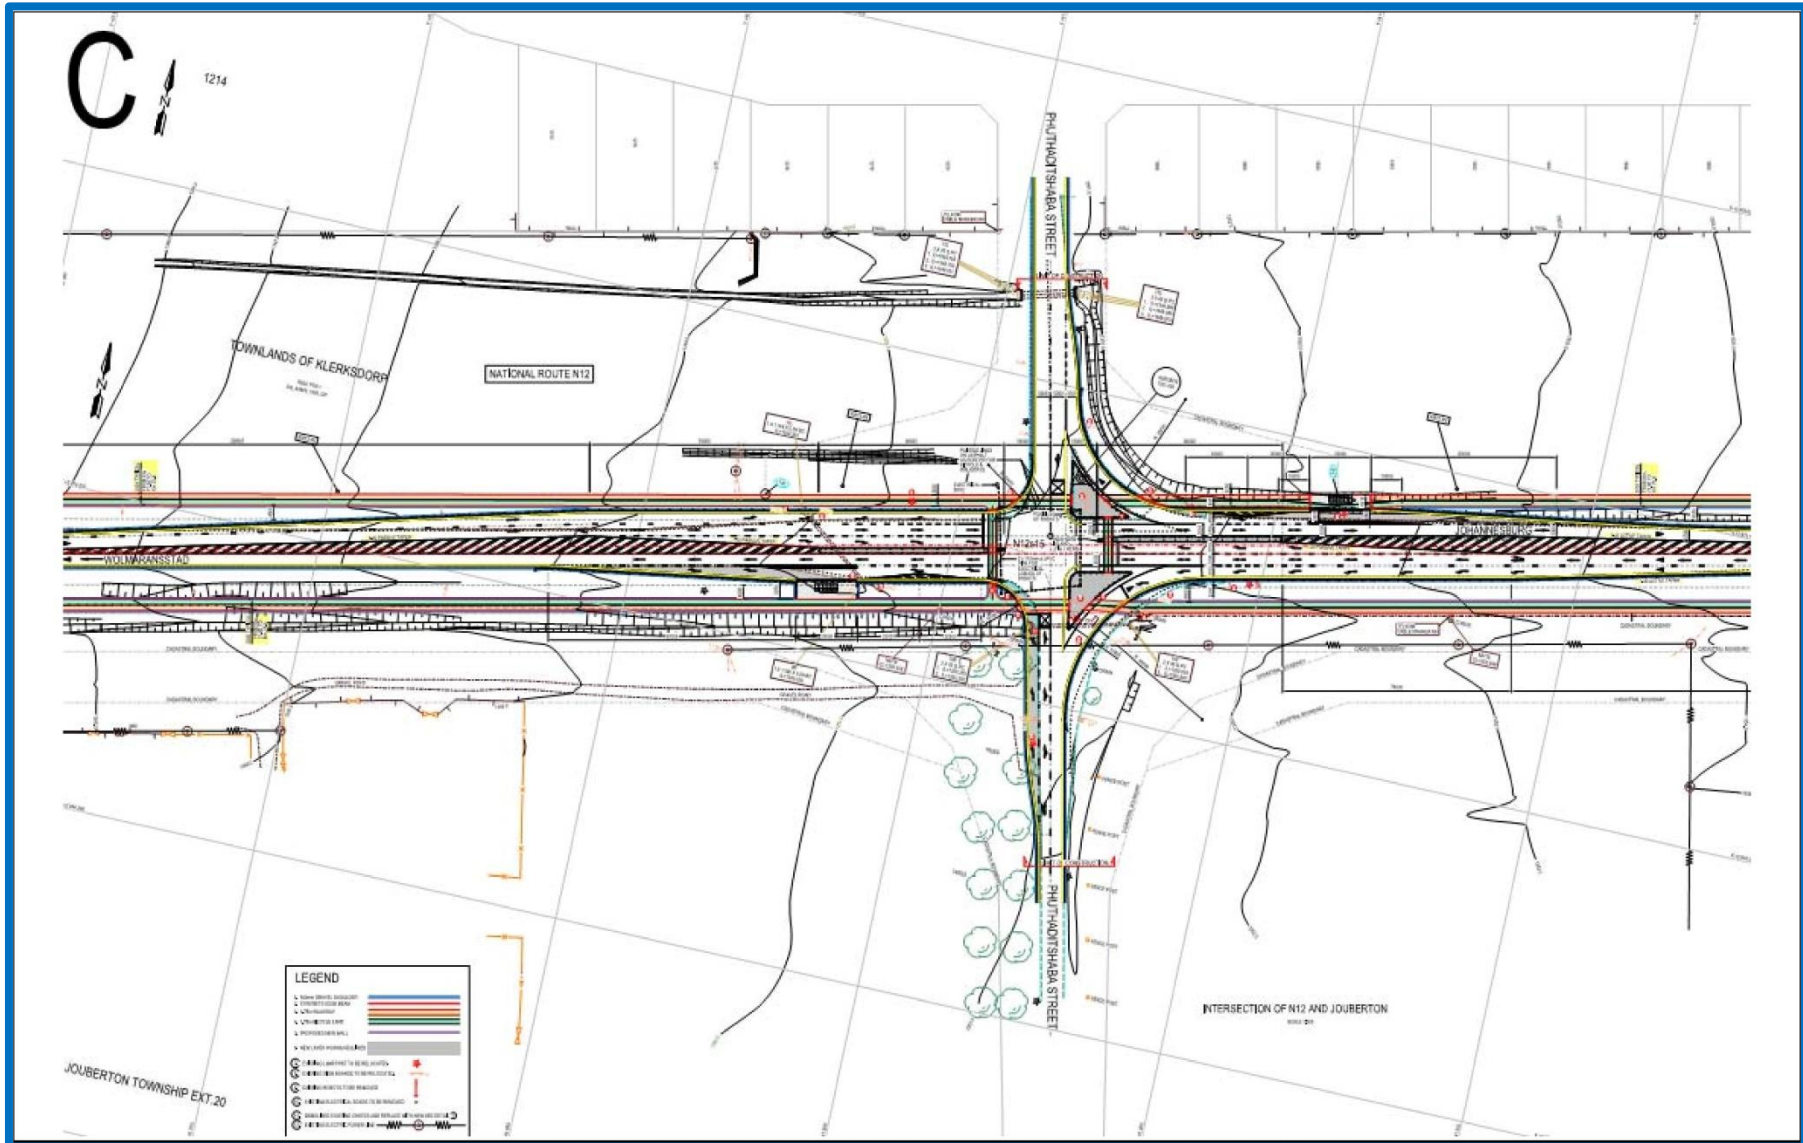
Road N12 and Omar Khayam Avenue/Lehalaangone (Phuthaditshaba) Street intersection (Point 3) upgrade by SANRAL
